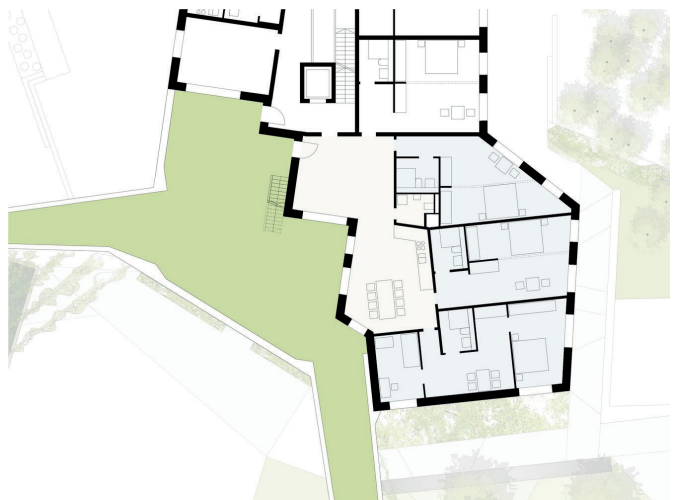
Floor plan of a four apartments sharing a common space (Archdaily, Gonzaléz)
